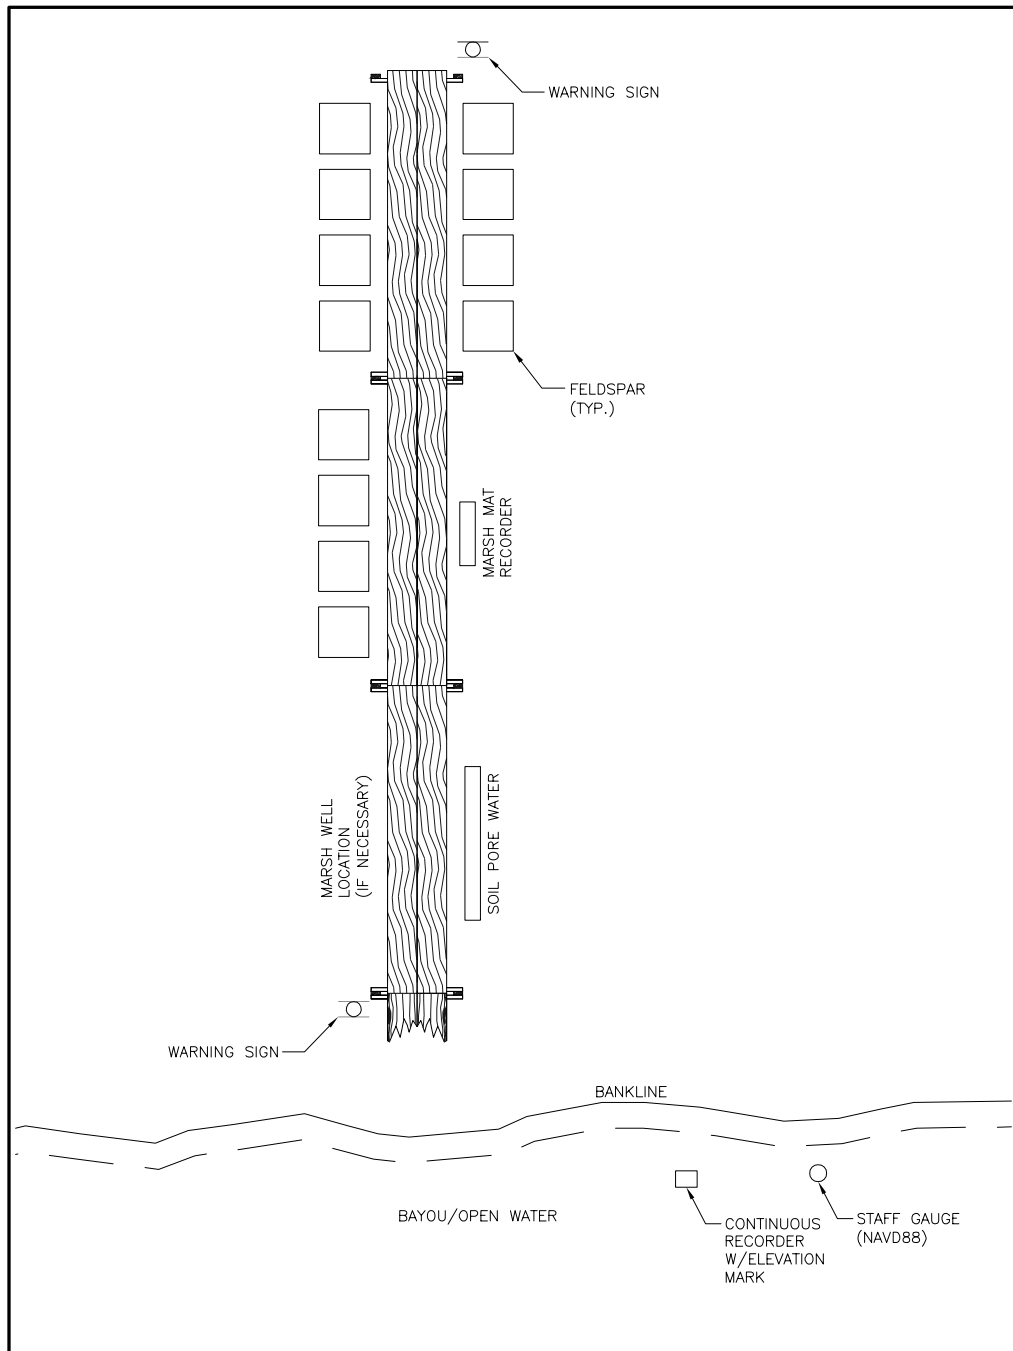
Typical layout schematic of the constructed site features at a floating marsh site.
